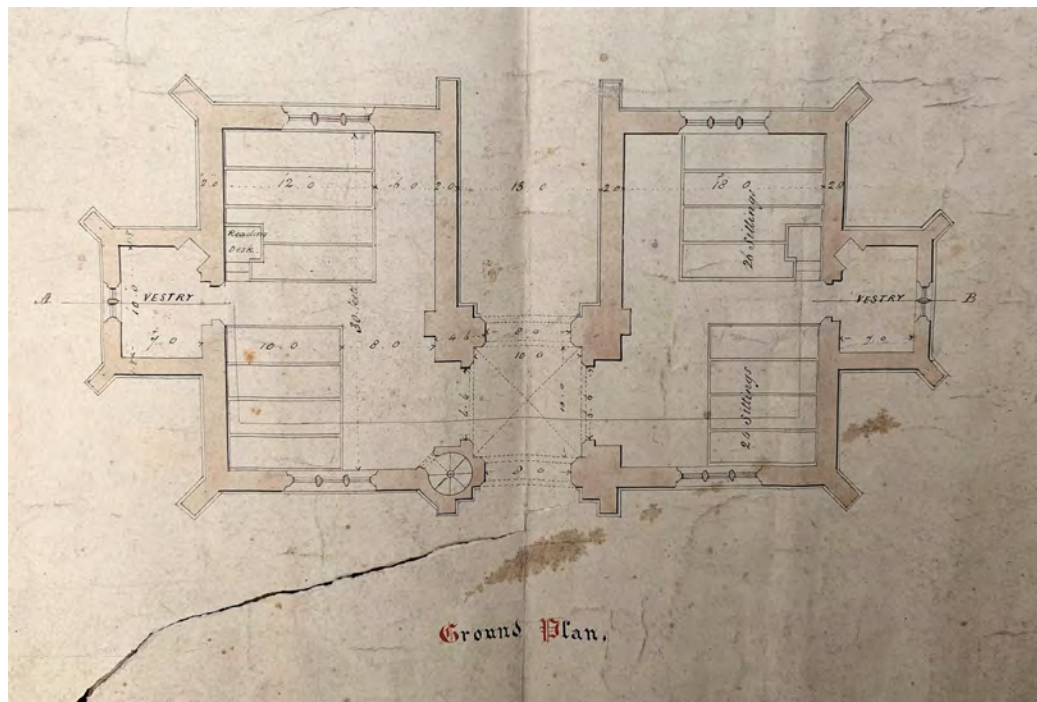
Ground plan of the building (Courtesy of Gloucestershire Archives)
